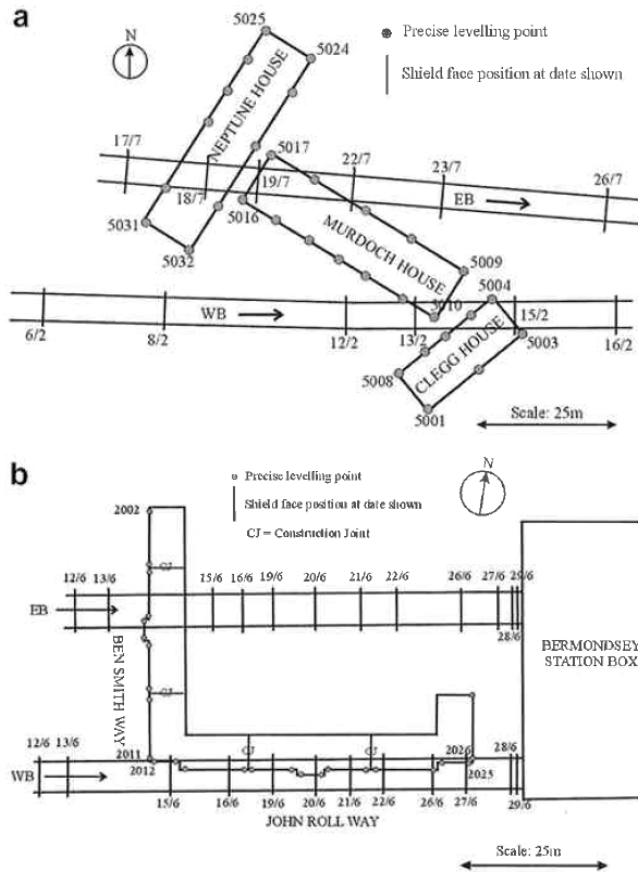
Plan of tunnel passage and position of monitoring points at (a) Moodkee Street buildings and (b) Keetons Estate.
